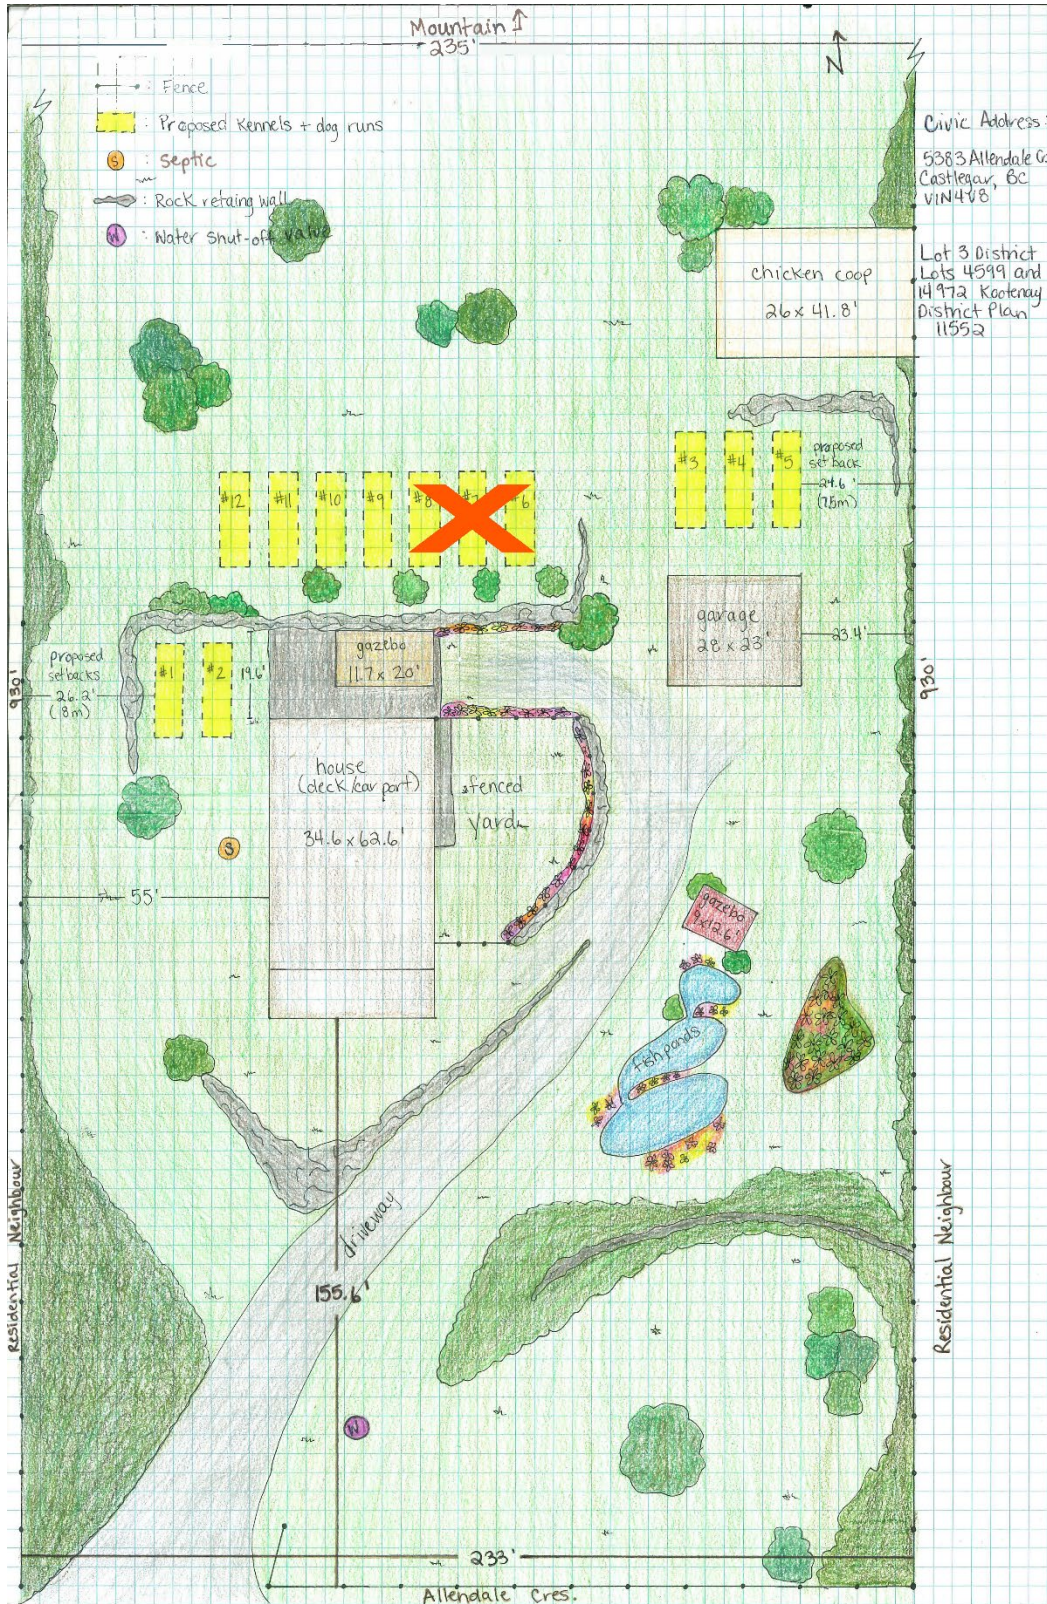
Site Plan showing the location of the proposed kennel structures. Note
